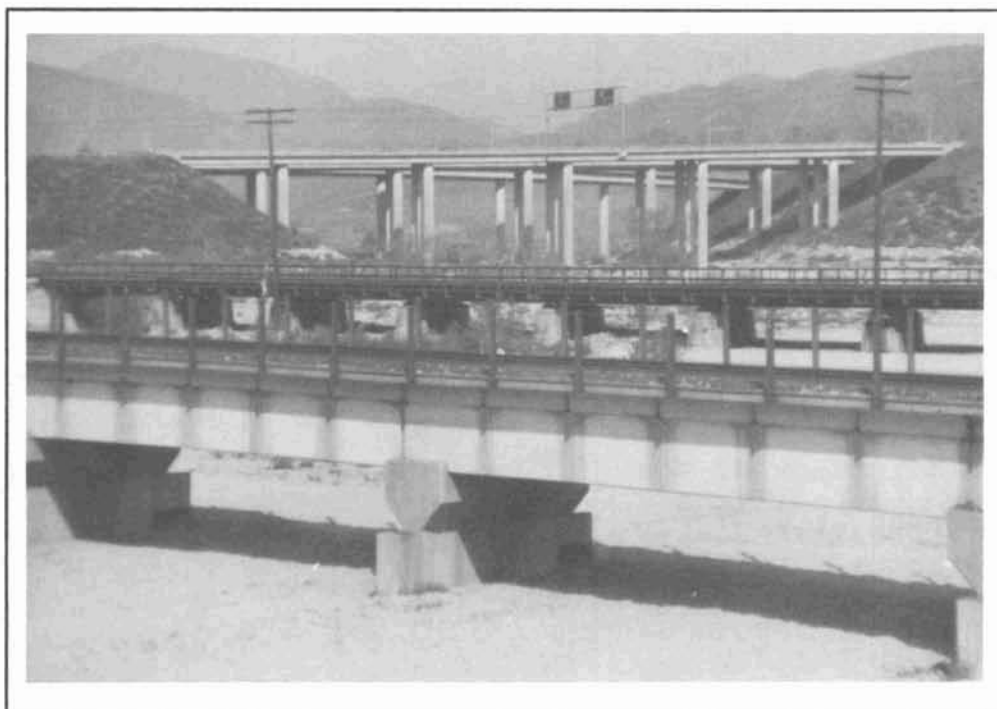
Railroad Bridges In Cajon Wash, I-15 Bridge In The Background
